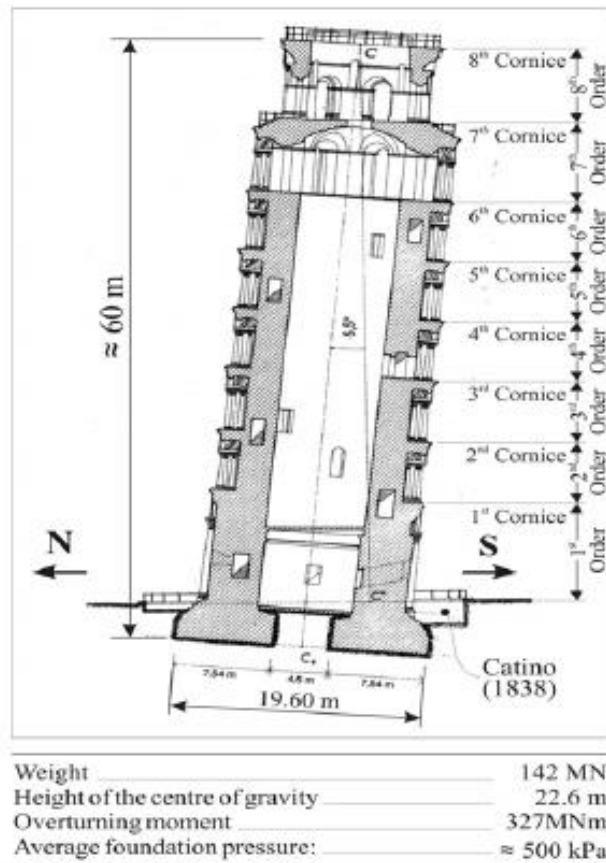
Cross-section of the Tower (Burland, Jamiolkowski, & Viggiani, 2009)
